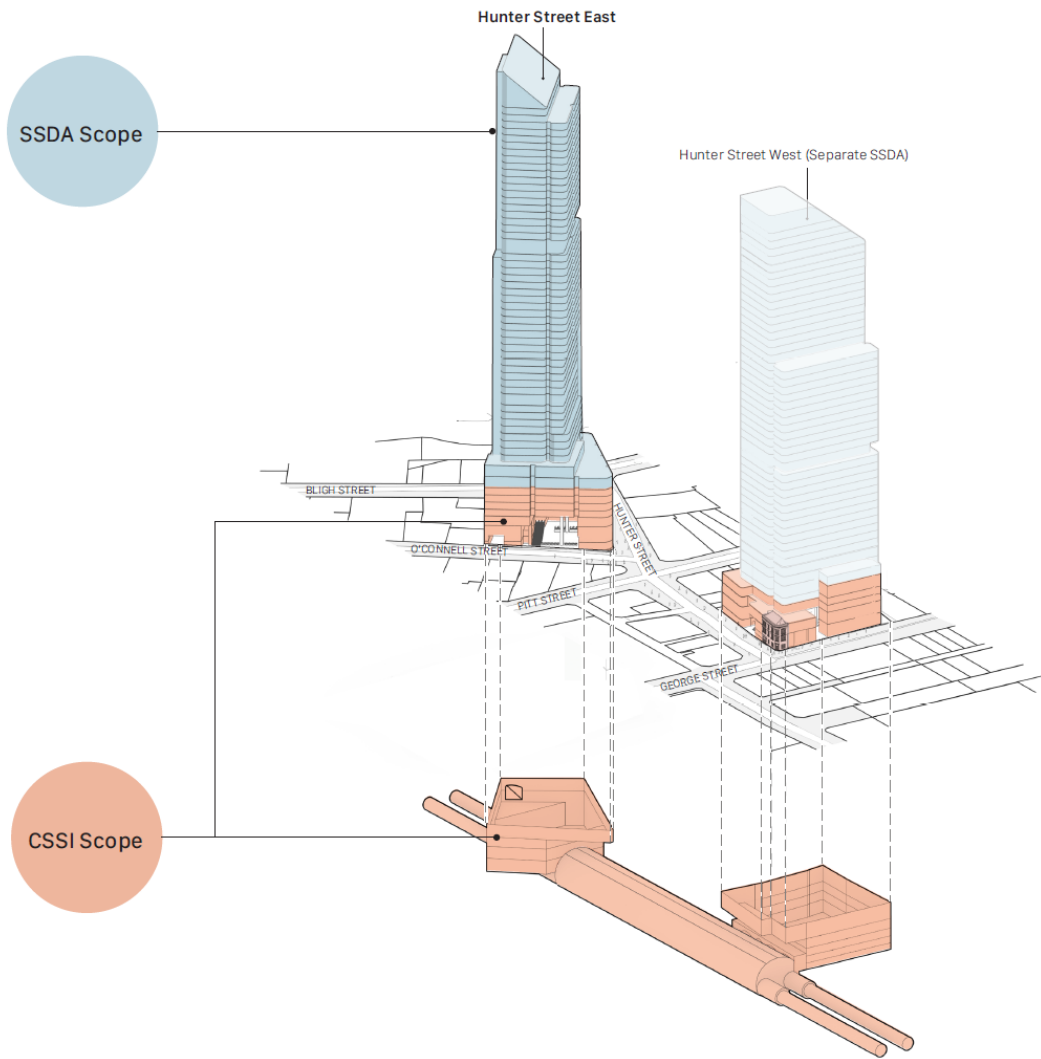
Proposed Concept SSDA development and CSSI scope
